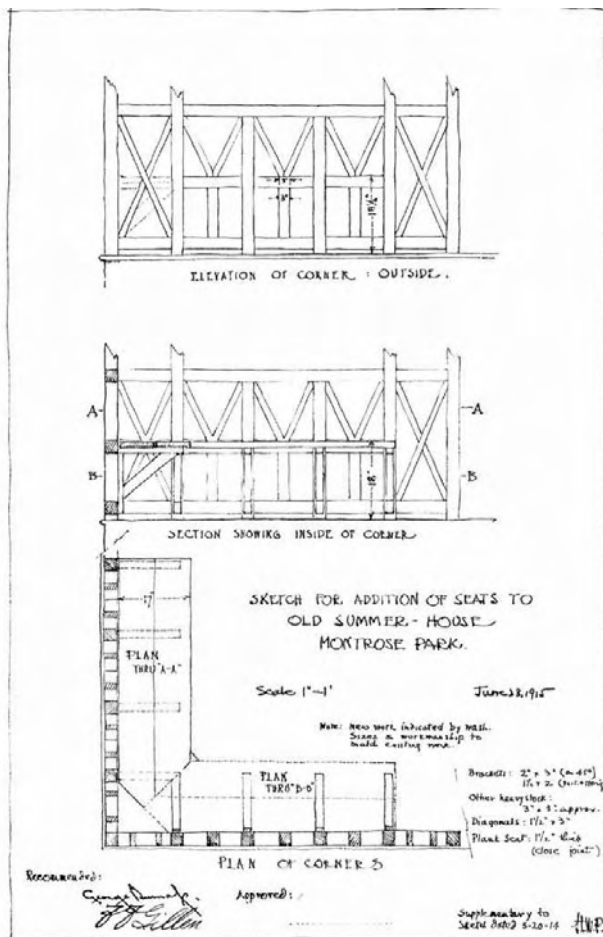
Sketch for addition of seats to old Summerhouse, June 23, 1915. (NPS/NCR, Prints and Drawing Collection #891/80021).
